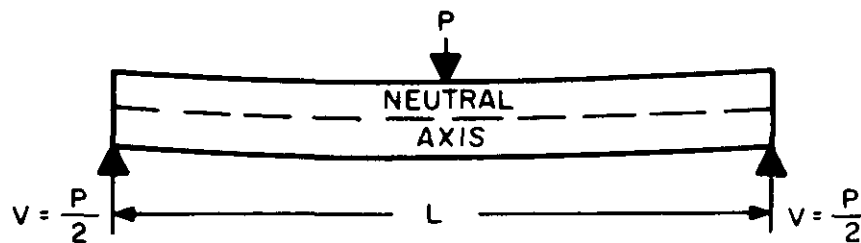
Horizontal or Longitudinal Shear in Simple Beam
